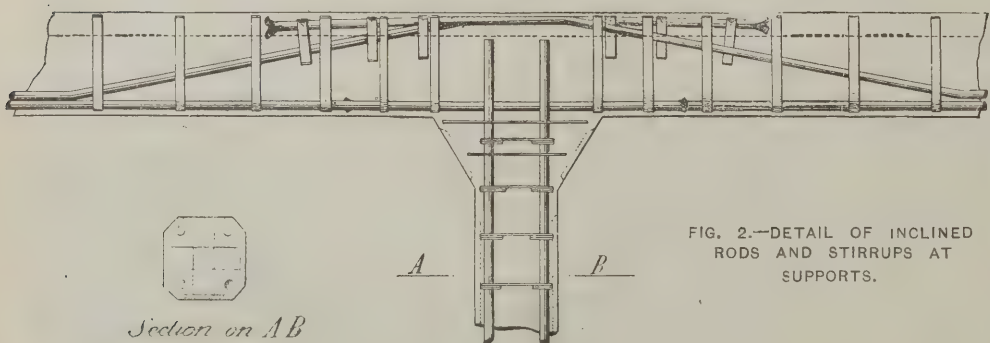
DETAIL OF INCLINED RODS AND STIRRUPS AT SUPPORTS.
